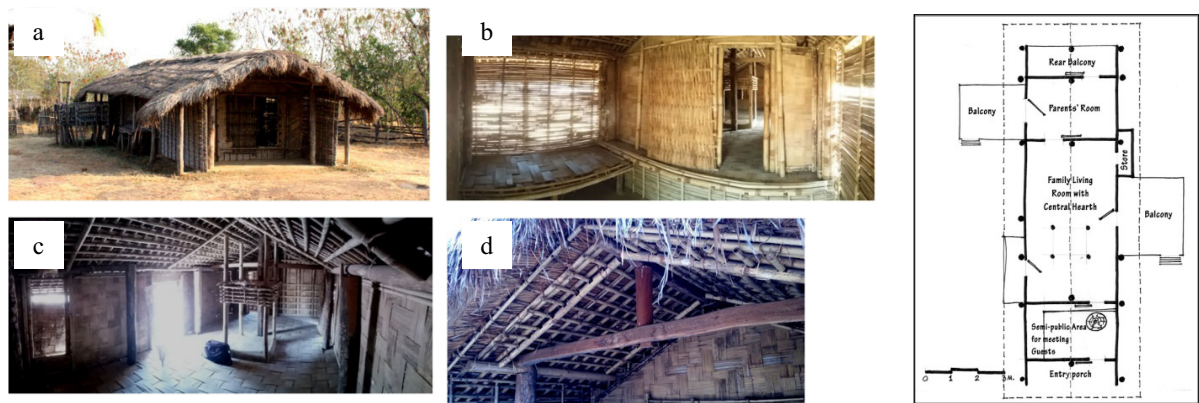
(a) View of Garo House, (b) (c) Interior view of the hut, (d) Detail of roof, (e) Plan of Garo Hut
